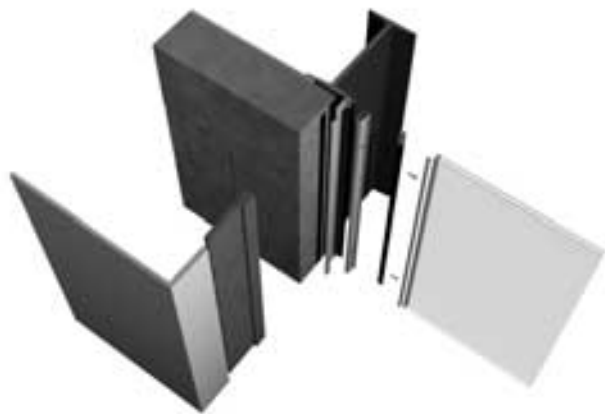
Detail study. Glazing jamb detail. Bramante Architects. Citizen Advice Bureau. Chessington. London.
